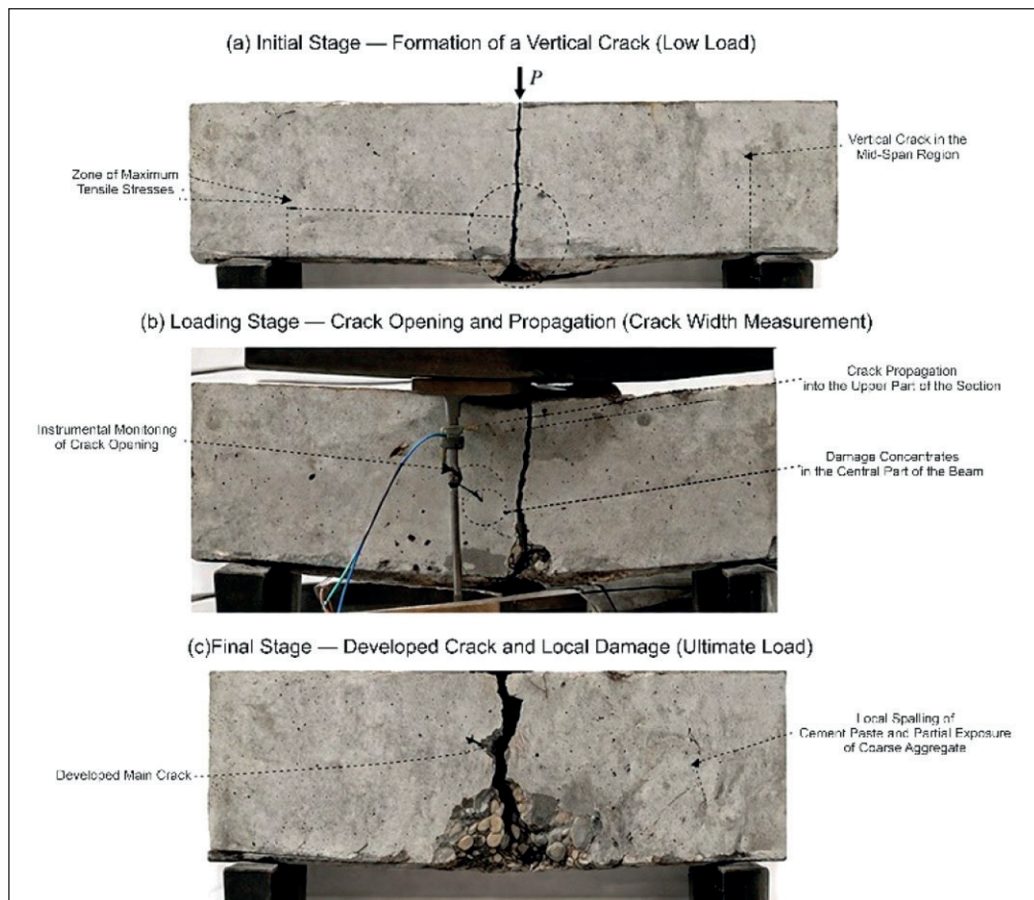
Development of cracks and opening of the major crack in concrete beams during flexural testing
